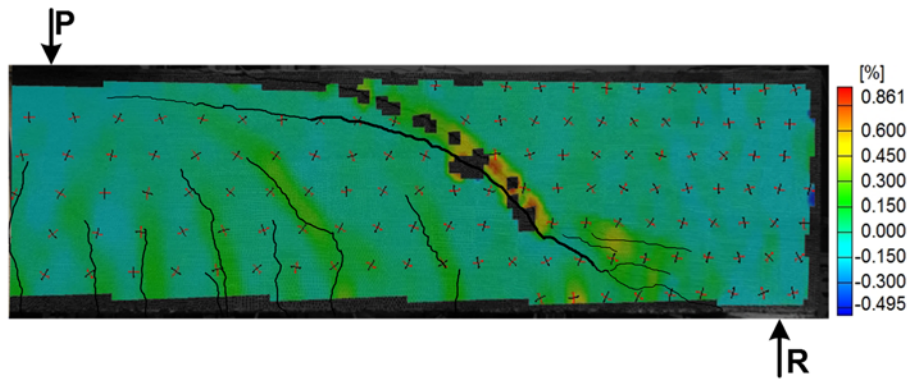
Full-field concrete longitudinal strain ( $\epsilon_x$ ) across shear span for specimen RC18b after failure
